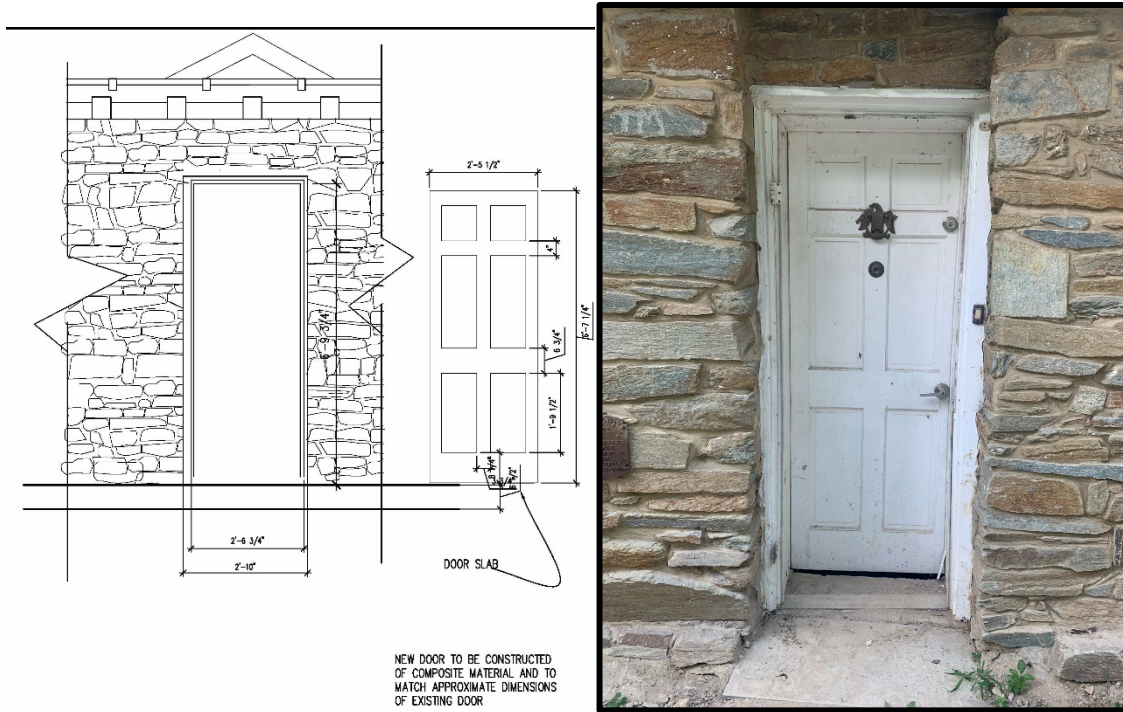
The as-built drawing for the back door and an existing photo of the door.
